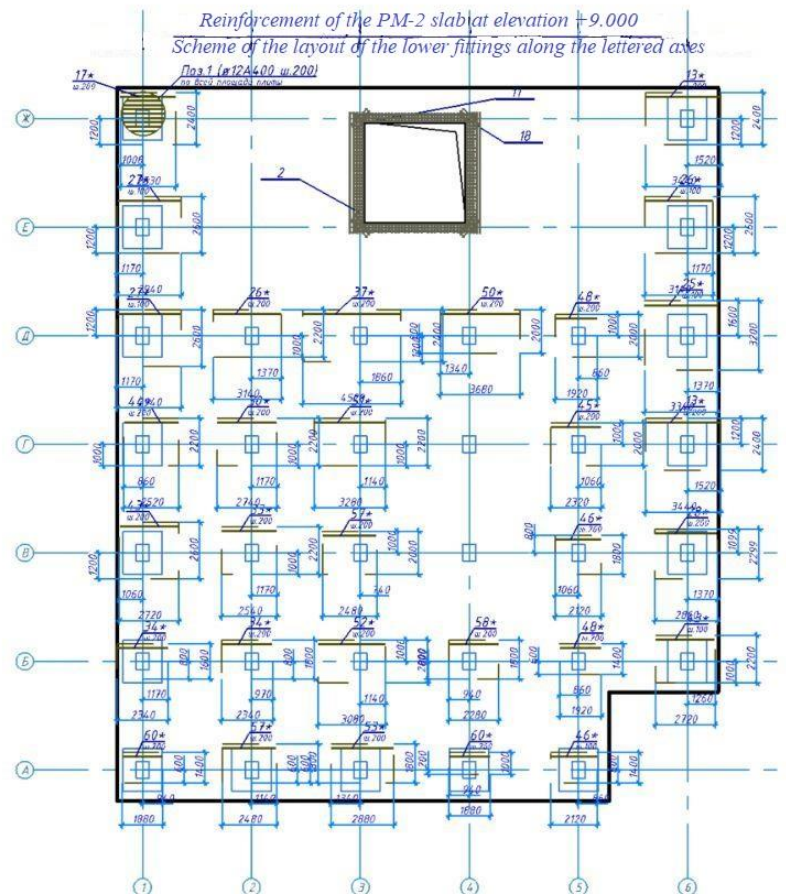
slab reinforcement PM-2 at elevation +9.000. Layout diagram of bottom reinforcement along alphabetical axes
